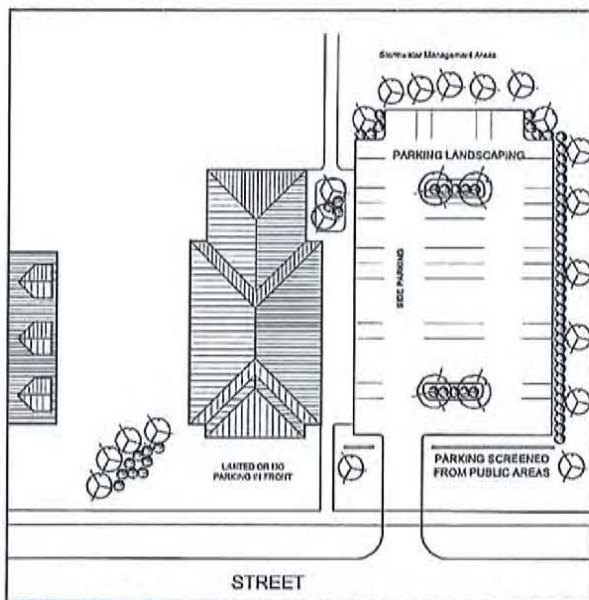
An example parking lot landscape plan with perimeter plantings and screening elements.
